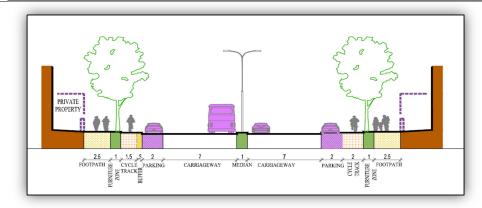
Street design proposal for 30 m wide road with footpath, cycle track, parking space and traffic carriageway
